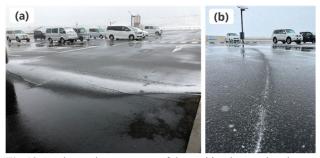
Cracks on the pavement of the parking lot ot a hotel
